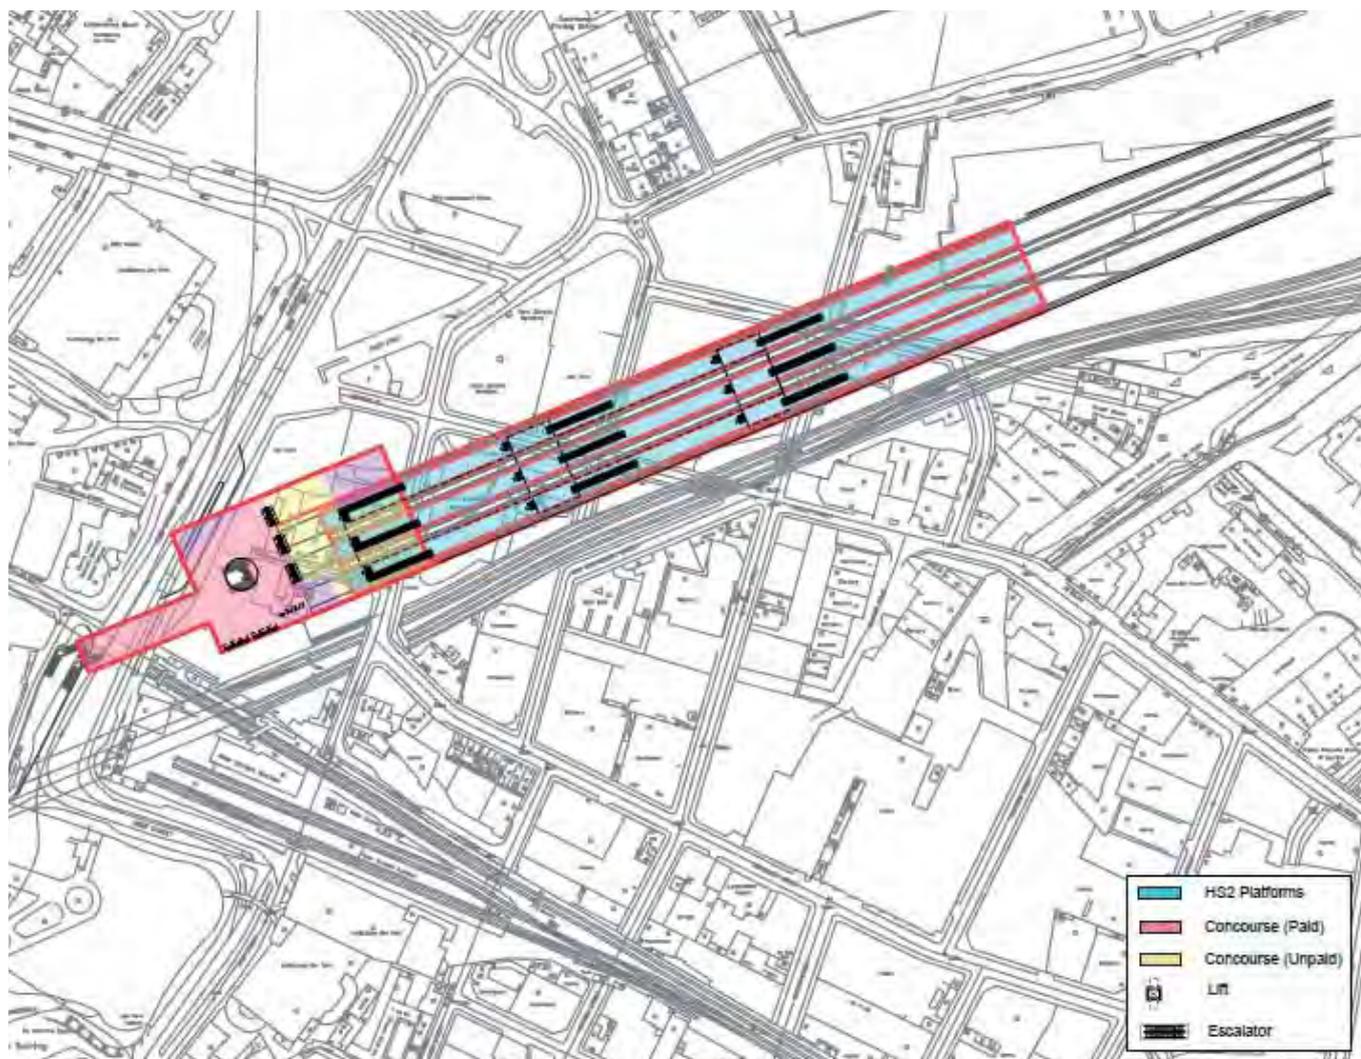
Layout of proposed Birmingham Curzon Street Station
